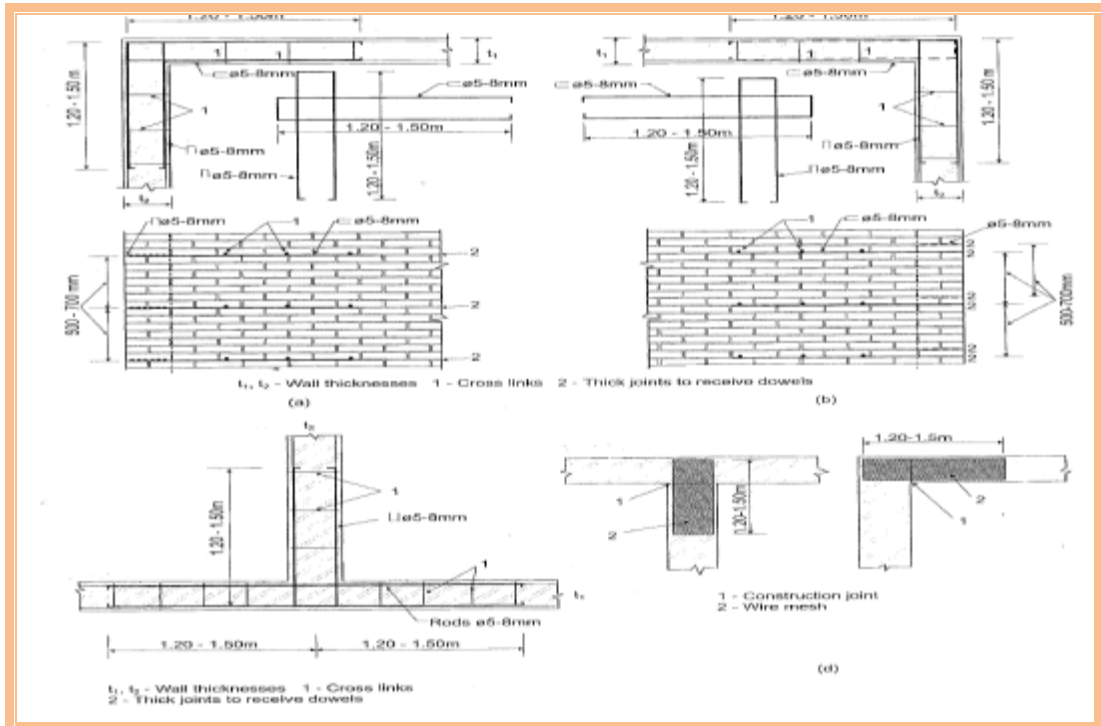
improvements of masonry construction by dowing and tie beams(Rush, 2007)
